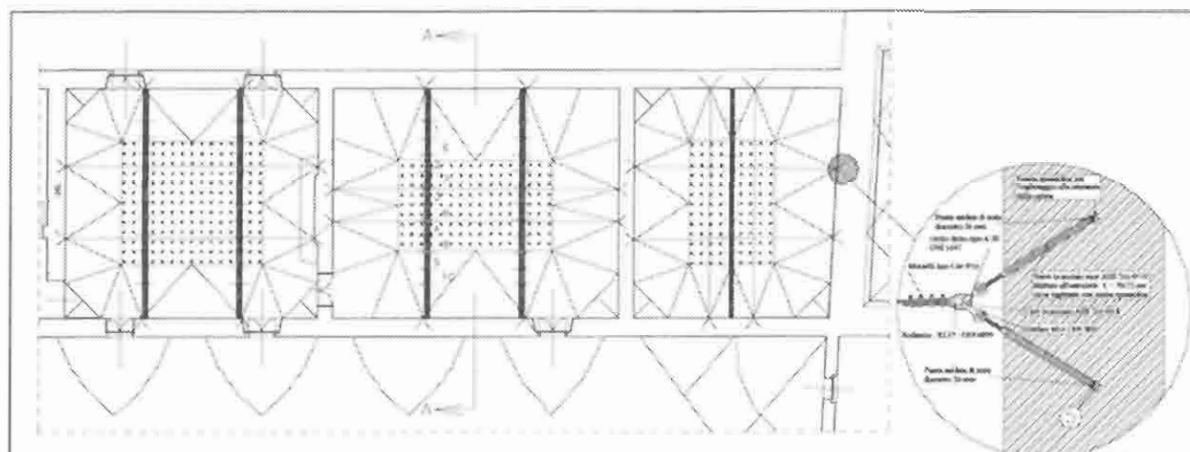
Floor plan and detail of the "Reinforced Arch Method".
